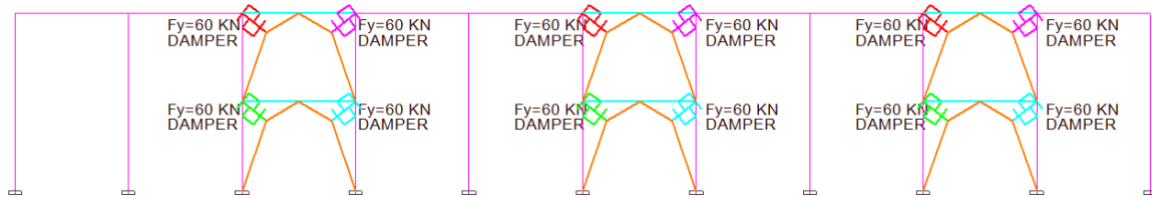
Damper application in Y Direction (dampers are in toggle braces)
